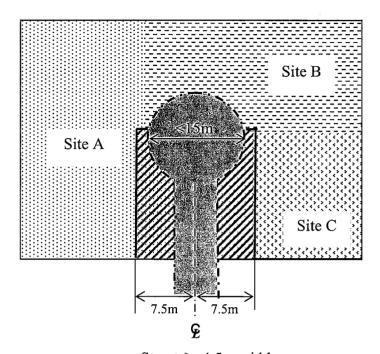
Example (4) of Building Setback – Site at the end of the street/cul-de-sac
